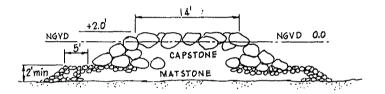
Typical Breakwater/Spur Structure Cross-Section
